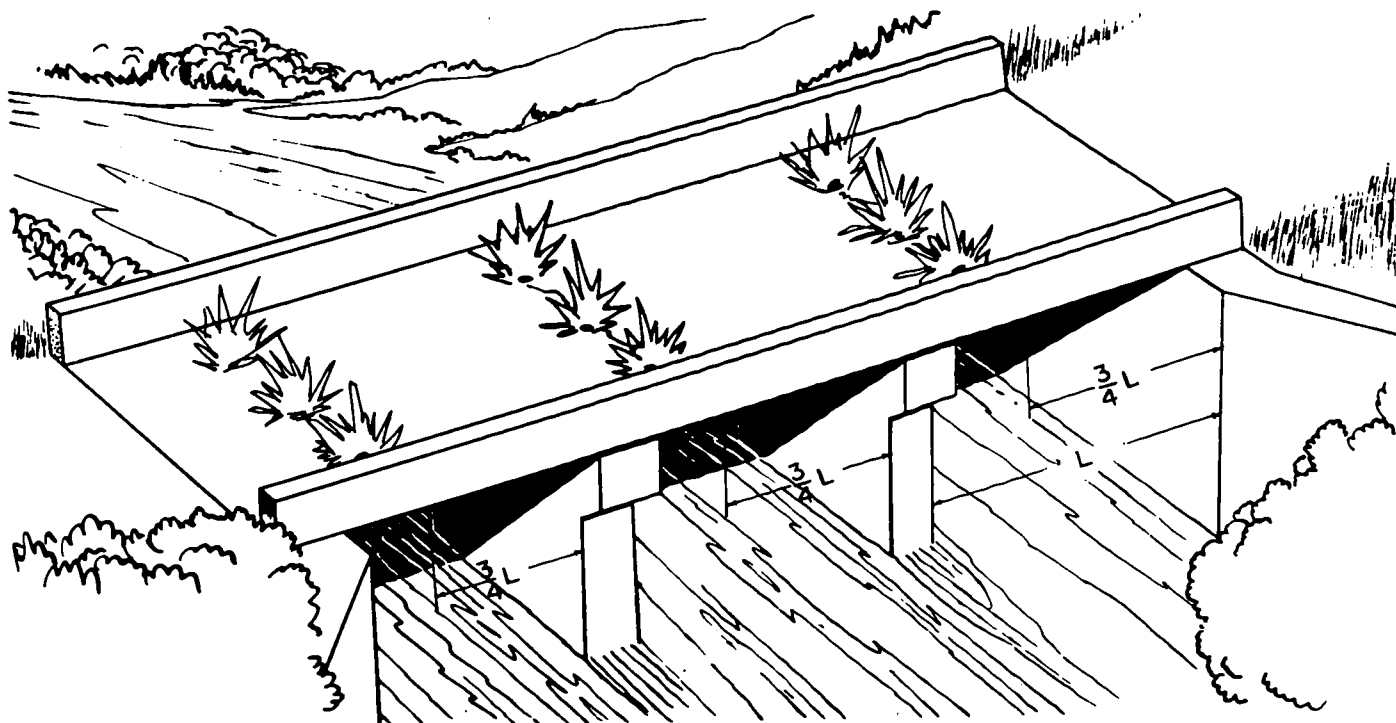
Complete destruction of continuous span concrete slab bridge.
